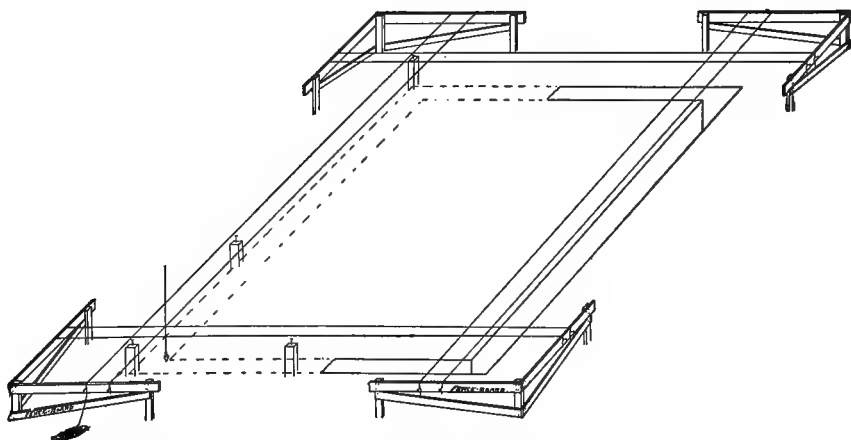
Stakes and Construction Lines indicating location of foundation walls.
